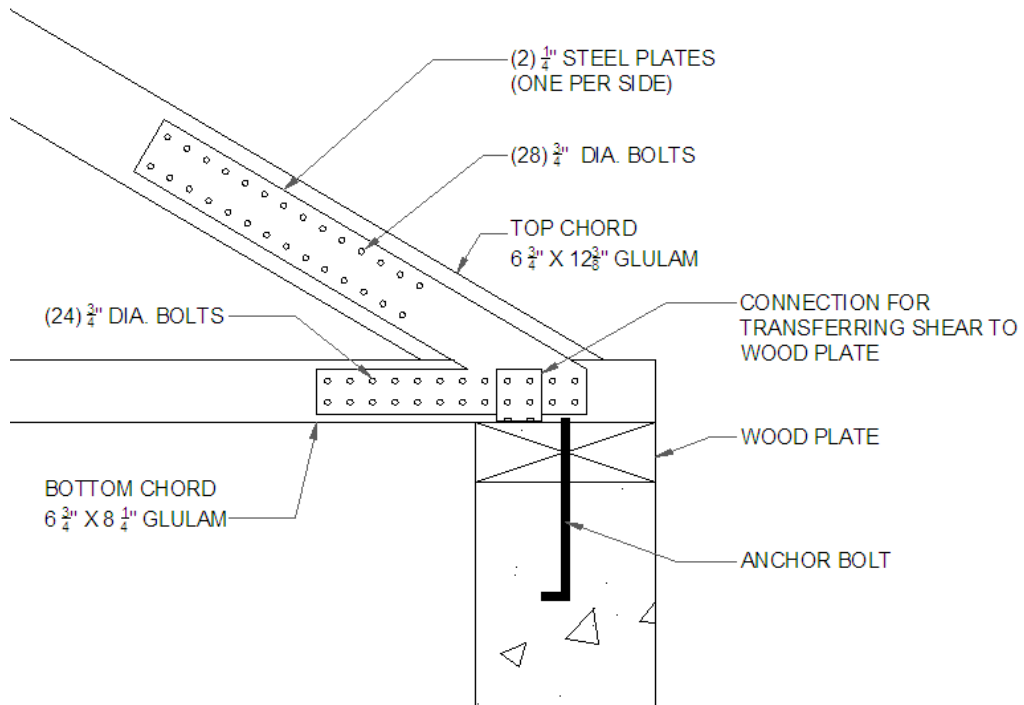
Typical Connection of Glulam Truss to Concrete Beam or Column of Concrete Moment Frame at Column Line 2
